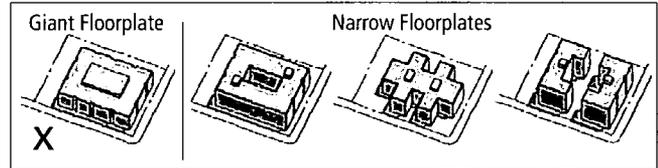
Building diagrams comparing the "giant" floorplates of conventional suburban commercial office development with the narrow floorplates of more sustainable buildings, which perform better in terms of energy consumption, daylighting, and ventilation.
